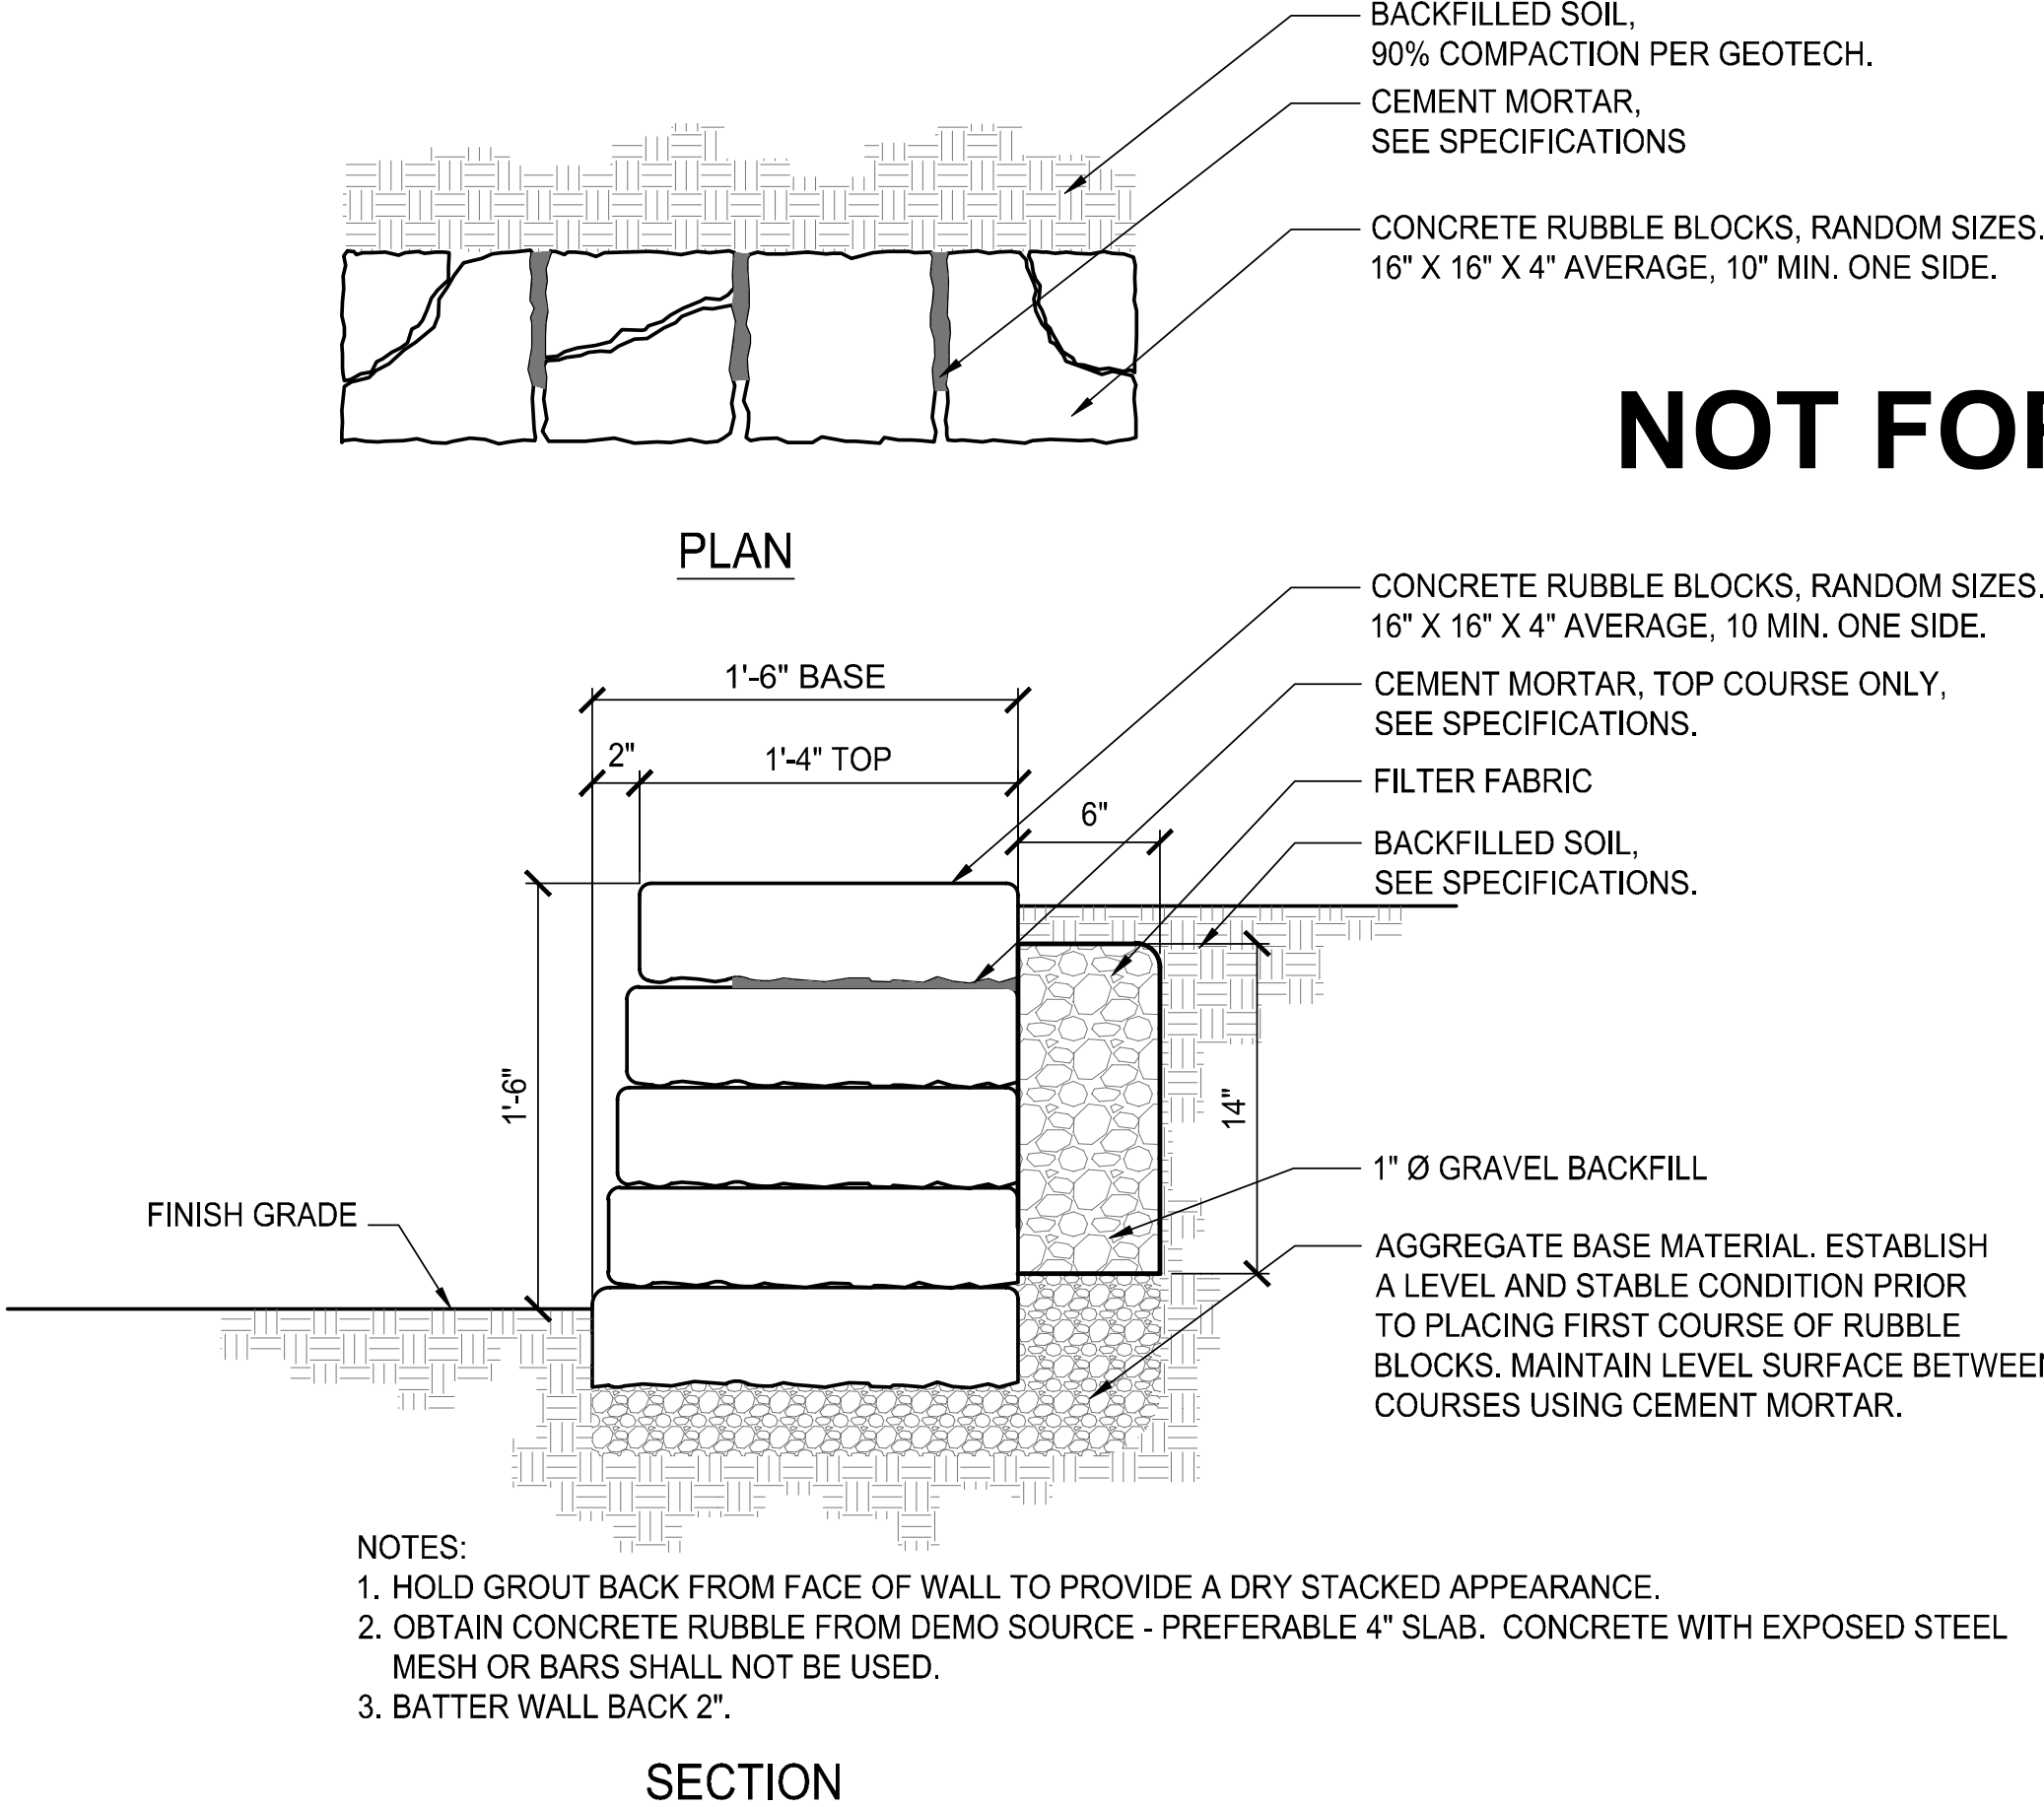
DETAILS FROM EXISTING WALLS FOR REFERENCE ONLY, NOT FOR CONSTRUCTION
